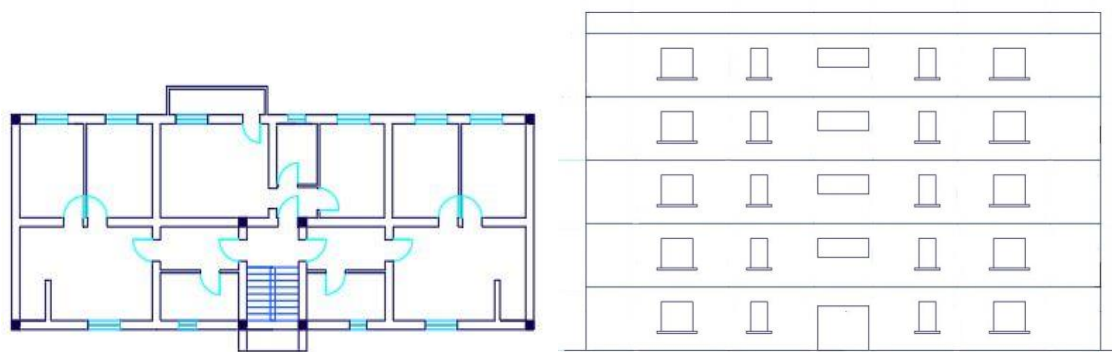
Building C2 plan view and facade view [AQTN, 2018]
